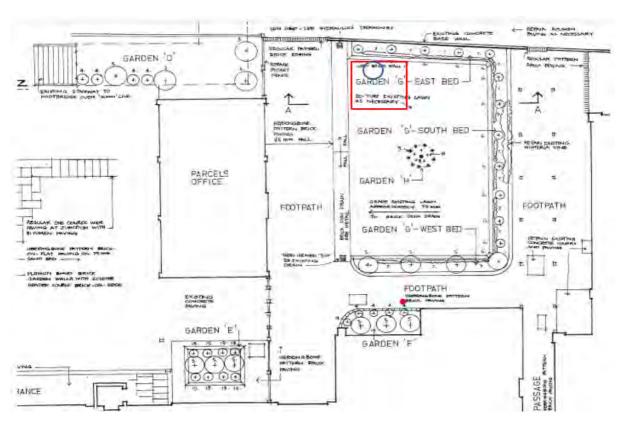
Extract from Moss Vale Station Renovations, Working Drawings, Site & Landscaping Plans and Details, Dwg No. 1801342, prepared by David Sheedy, July 1986, for State Rail Authority of NSW. Showing the proposed upgrade works with details to the courtyard garden, Garden H, including new brick wall garden beds, dish drains, sump existing concrete wall. The approximate location of the lift is shown in red and the pothole in blue. (Source: extract from Moss Vale Station Renovations, Working Drawings, Site & Landscaping Plans and Details, Dwg No. 1801342, prepared by David Sheedy, July 1986, for State Rail Authority of NSW)
